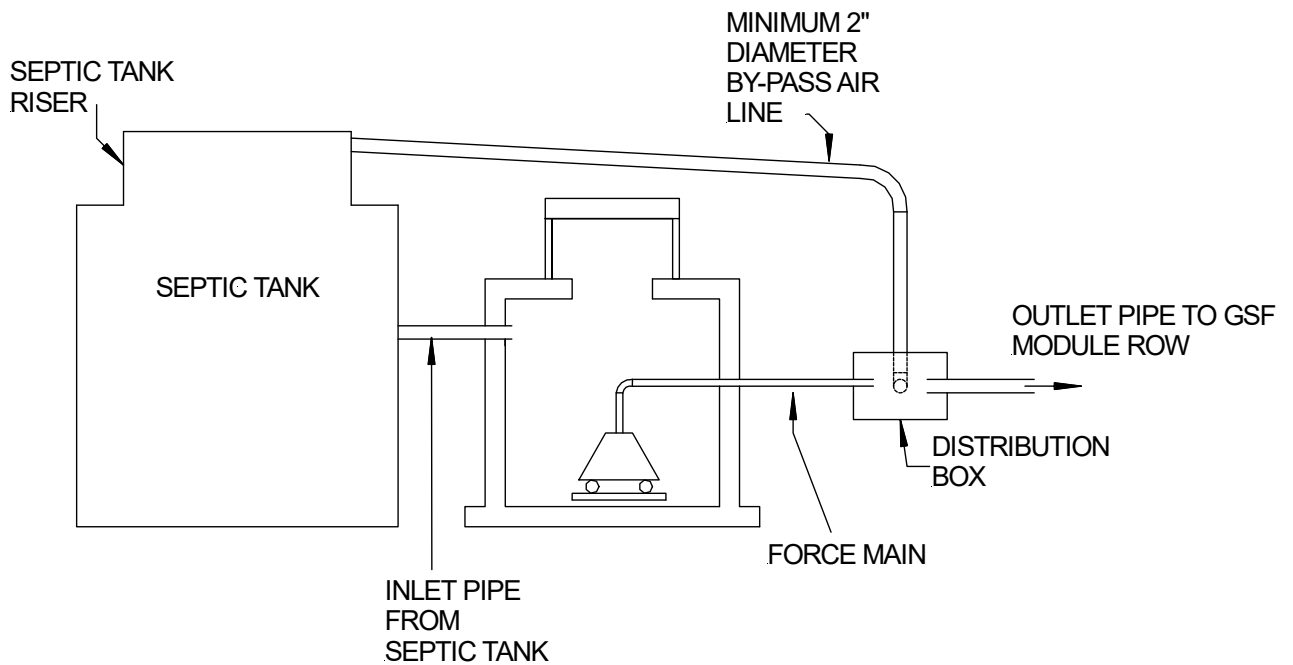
Air By-Pass Line Plan View for Venting of Pumped Systems
